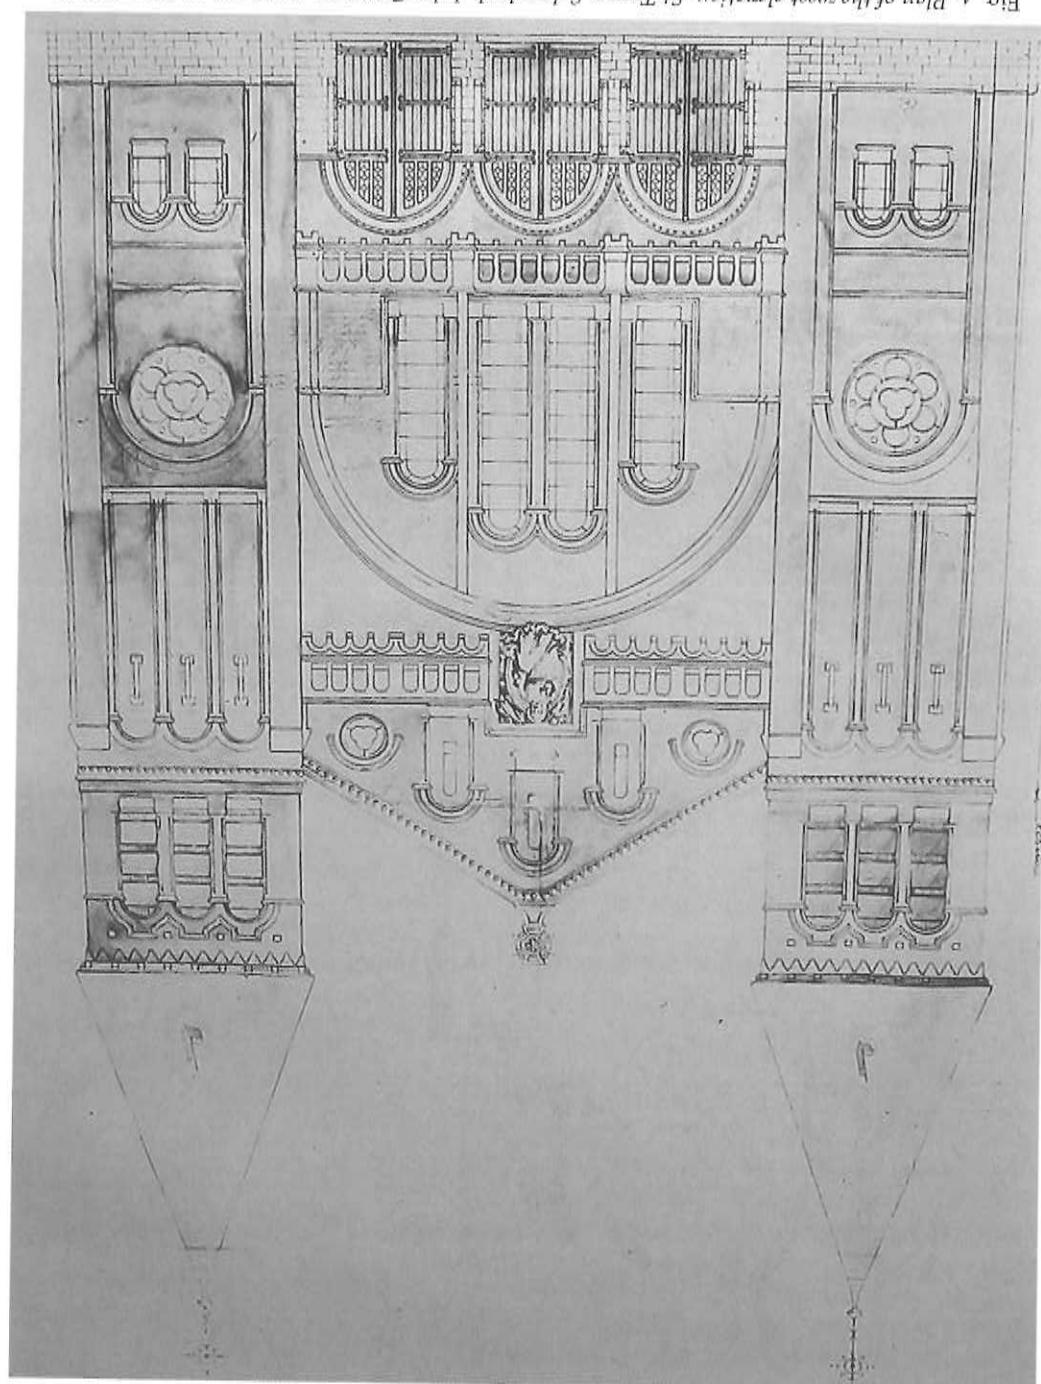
Plan of the west elevation, St Teresa, Schaarbeek, Jules Coomans, 1926-31: an example of a church designed in a historicist style (Schaarbeek, St Teresa, Parish Archives)
